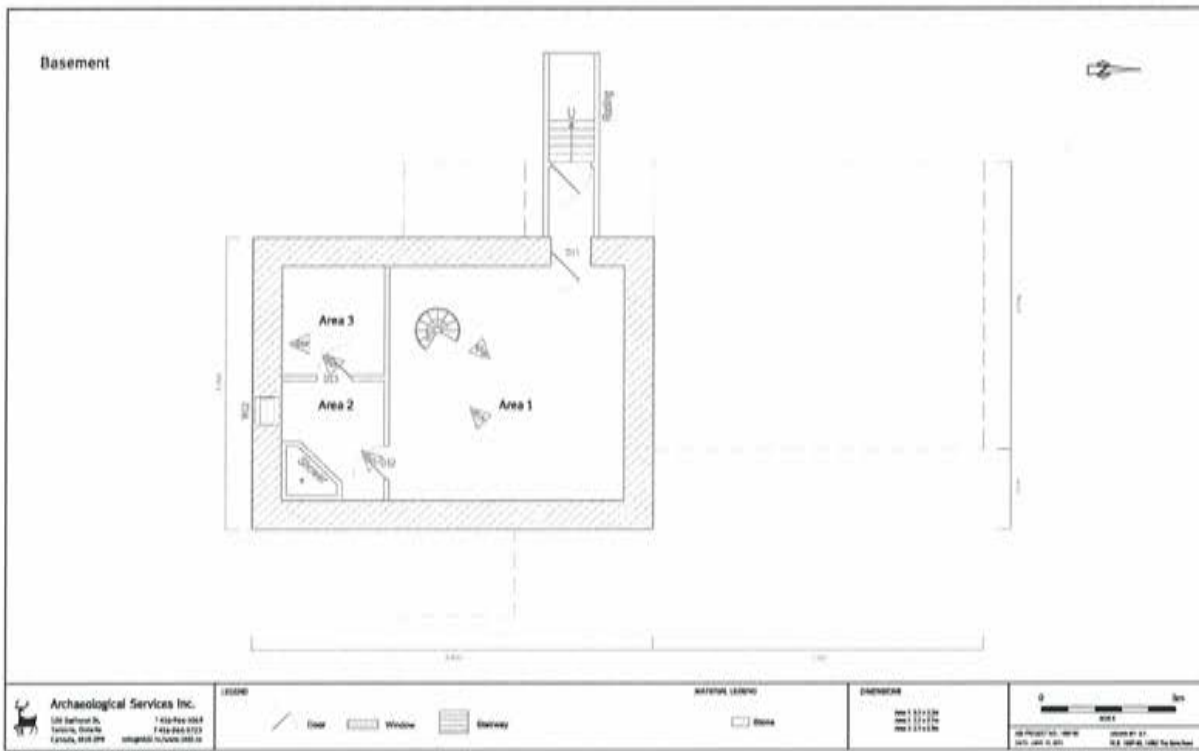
Interior floor plan of basement showing overall dimensional measurements of residential exterior and internal rooms.
